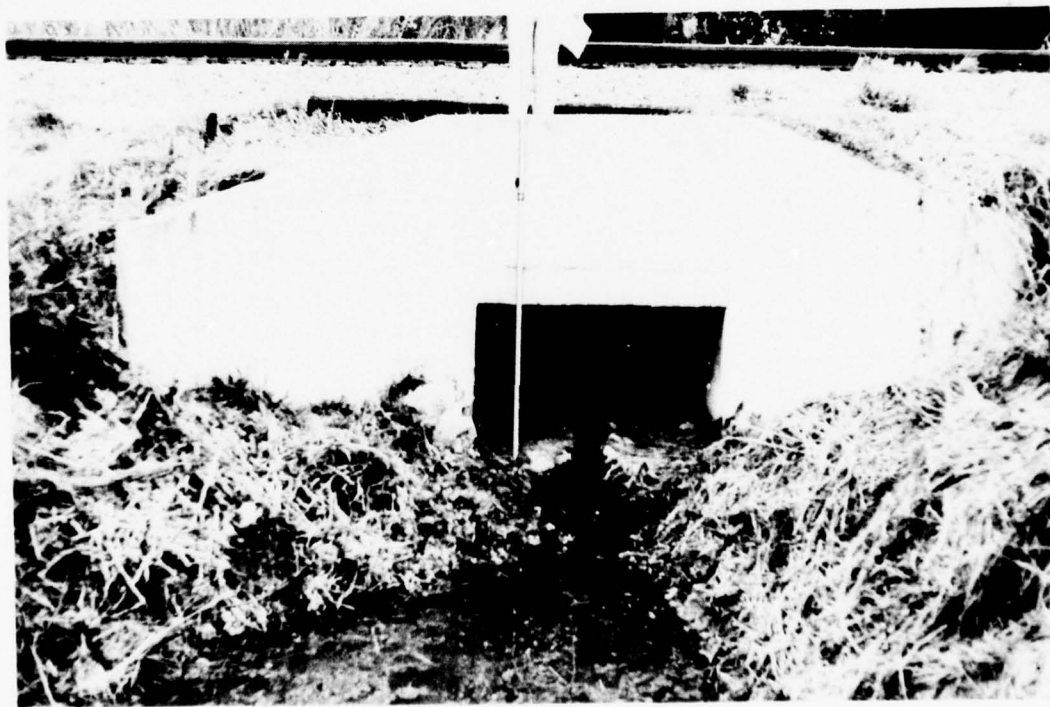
Culvert (structure 2) outflow from Lake Jessamine
